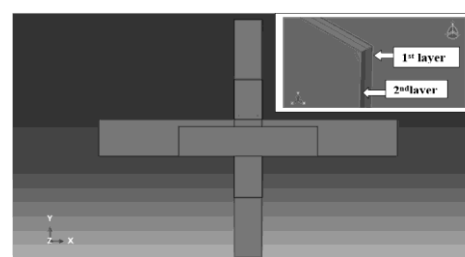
Retrofitted beam-column joint with two layers of TRM.
